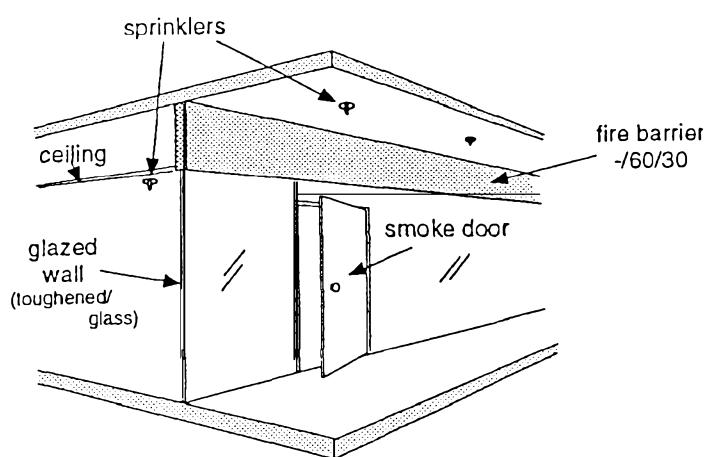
BOUNDING WALL CONSTRUCTION
